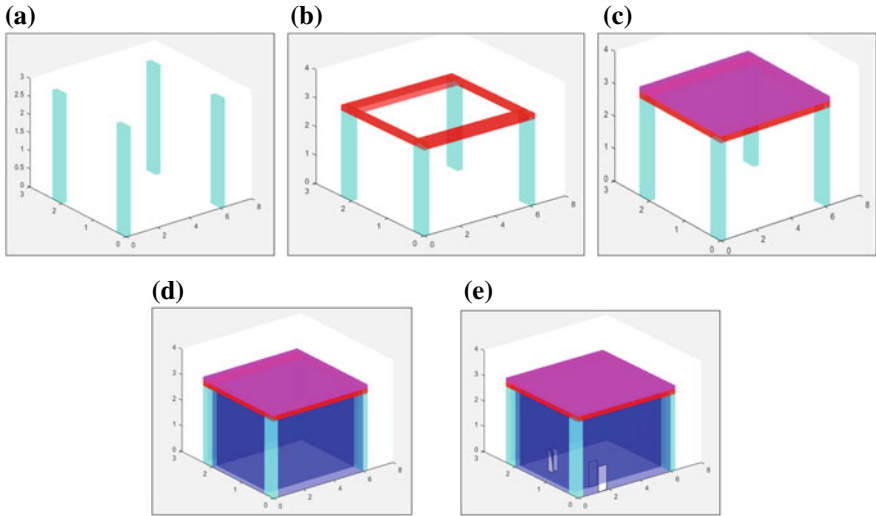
a Generation of column elements, b Generation of beams over columns, c with beams and columns, d Walls with slab, beams and columns and e Door and Windows with walls, slab, beams and columns
